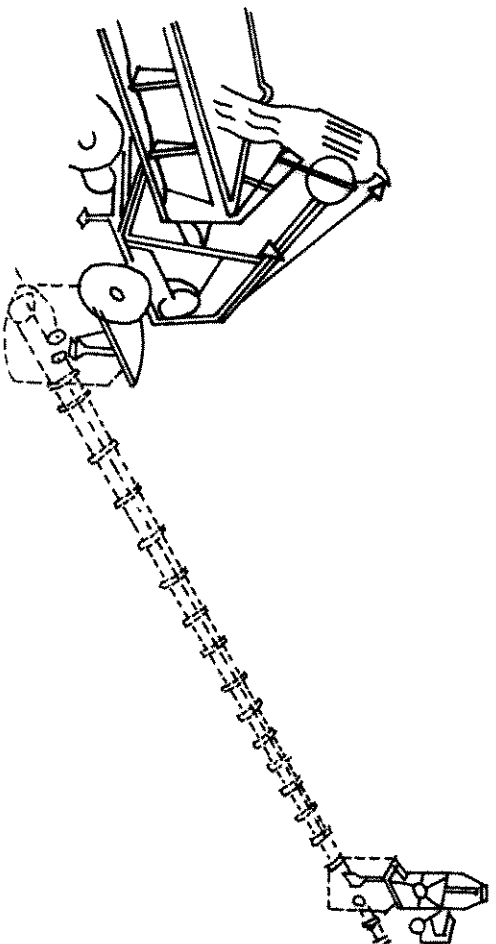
SEWER CLEANING BUCKET MACHINE
